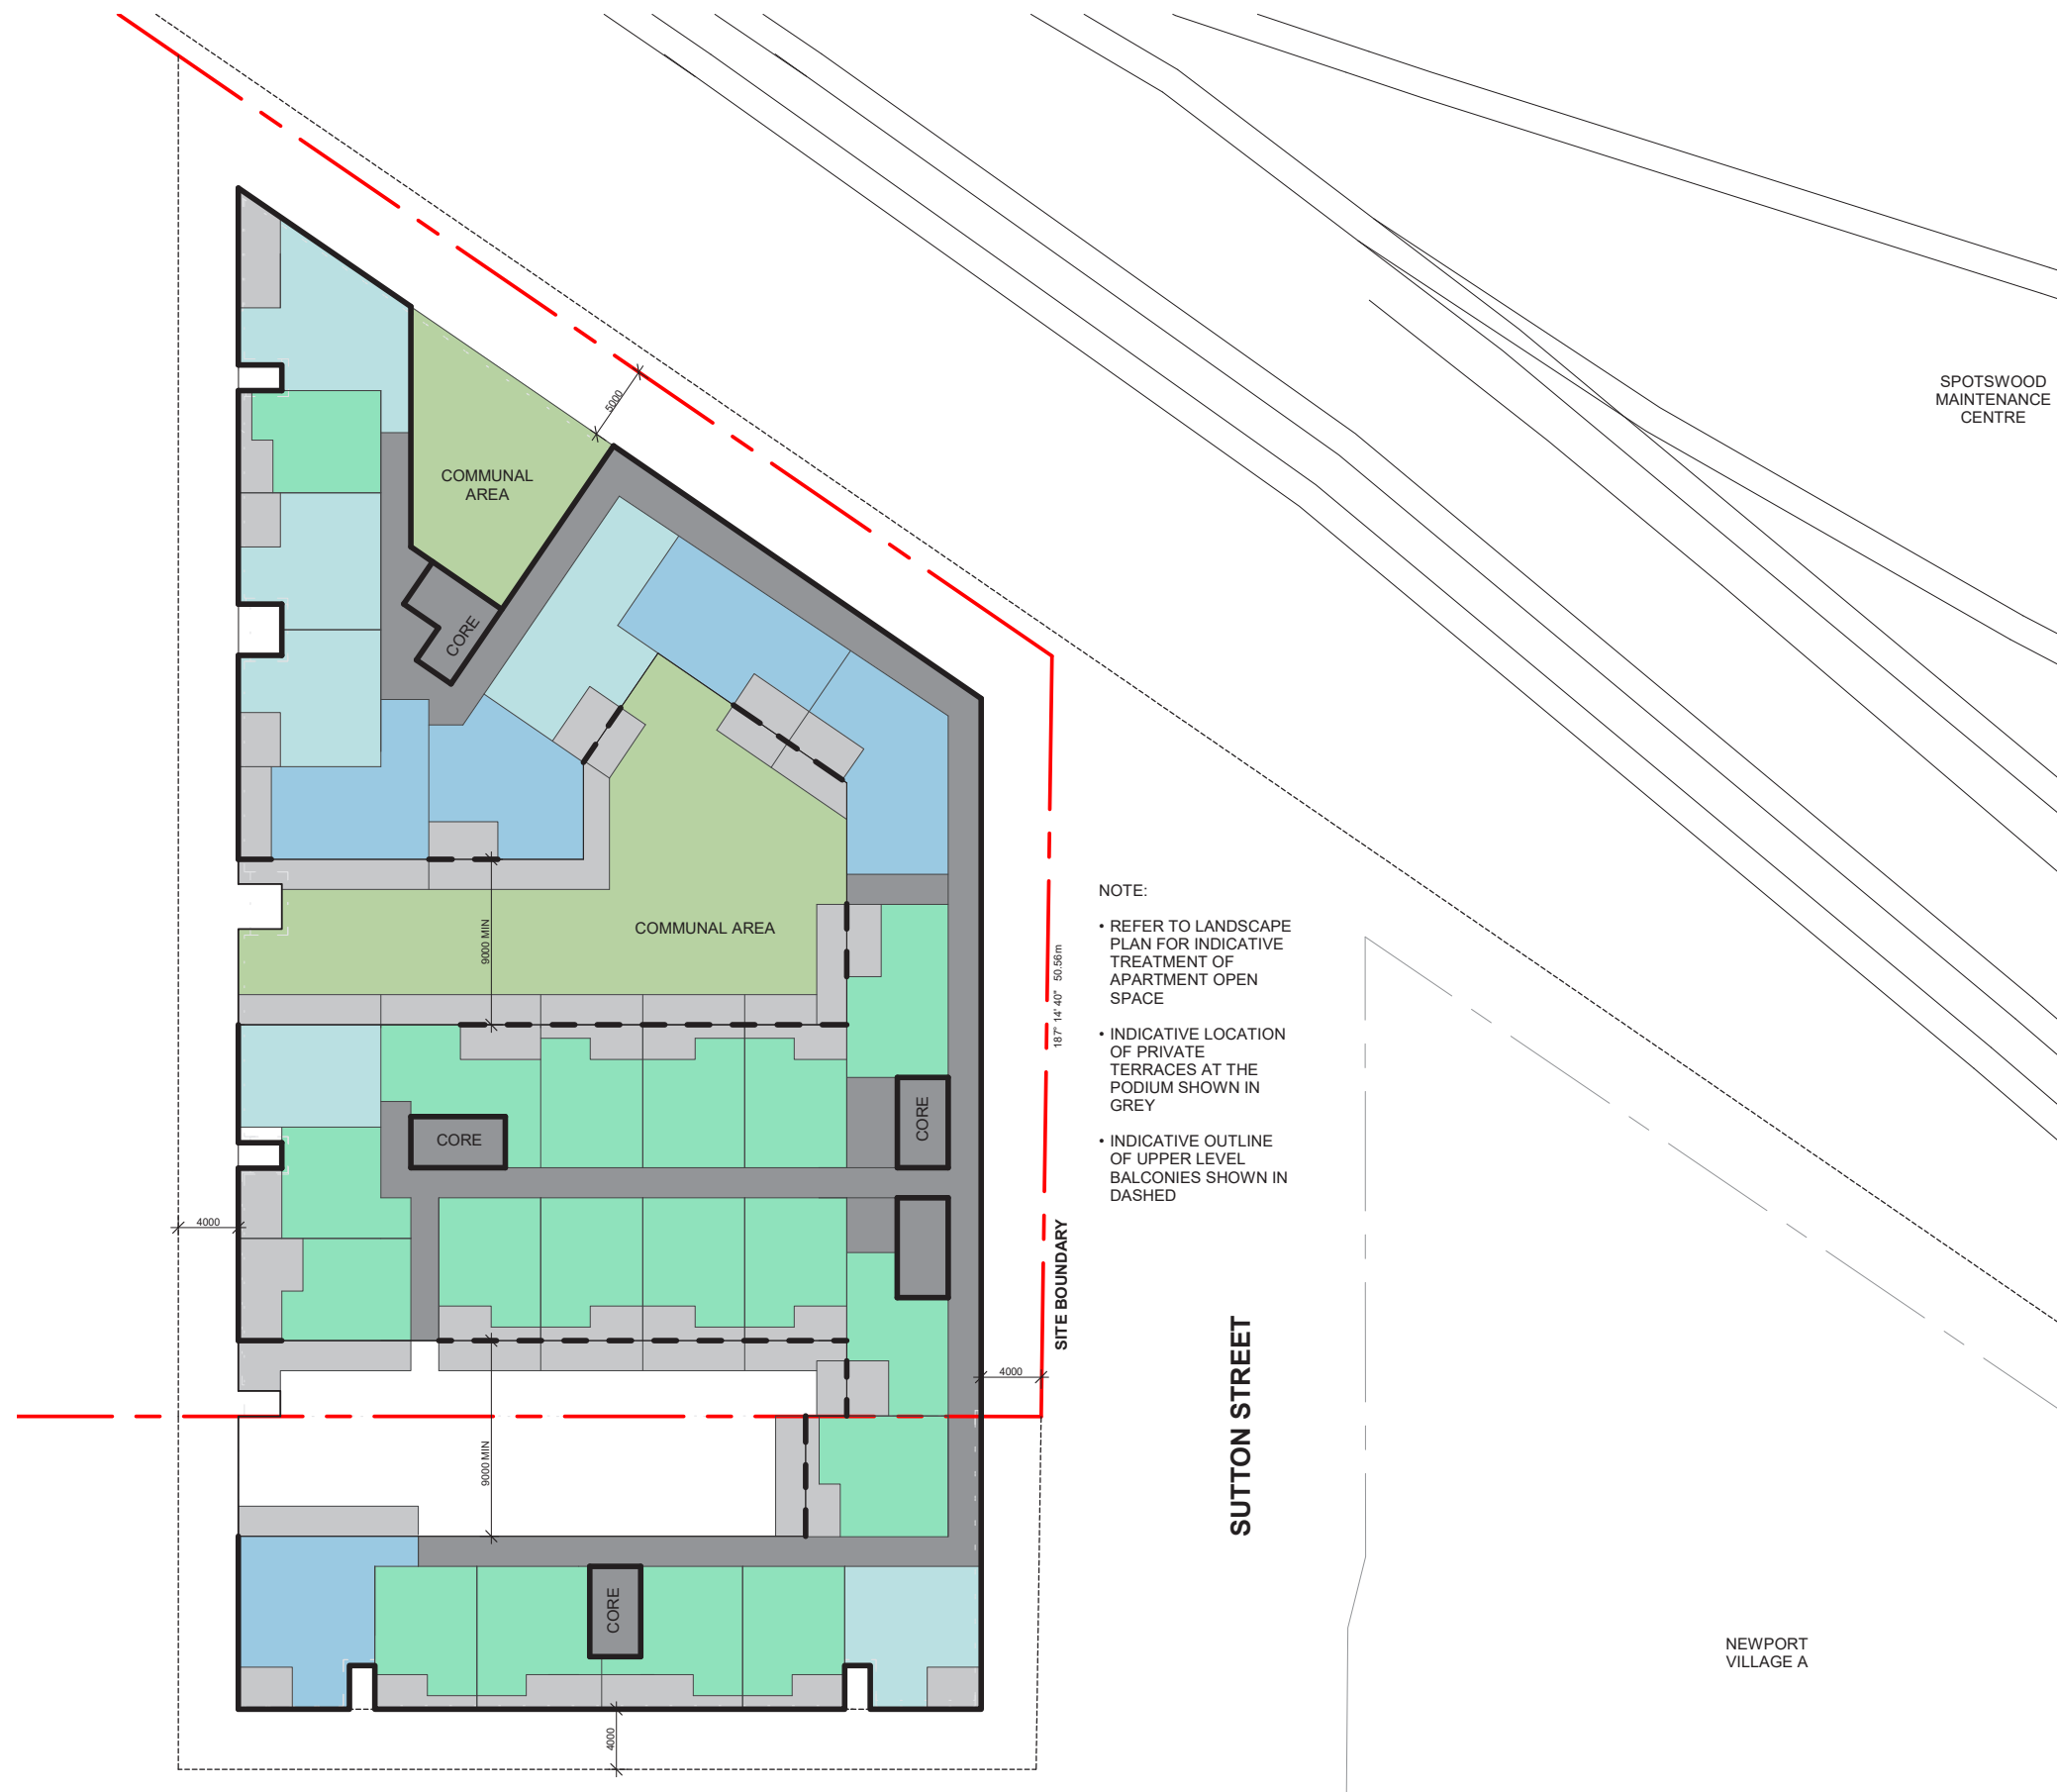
Indicative layout of the podium level, showing the possible layout of apartment balconies and communal open space, as well as separation distances between apartments. This figure is indicative and subject to change, as the final detail of the apartment building will be determined during a future planning permit application.
